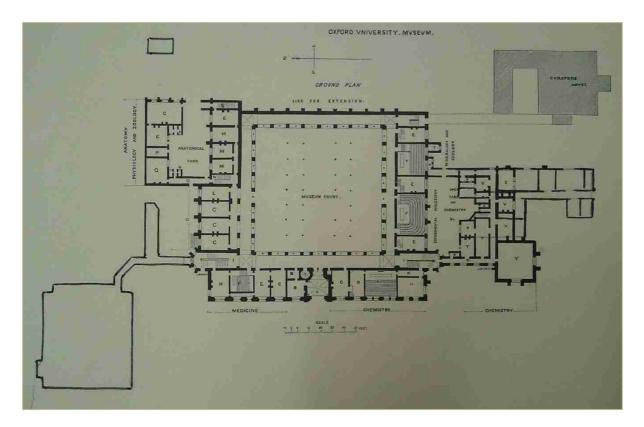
Plan of the University Museum c.1872 with additions inked on. Note the eastern elevation is labelled 'SIDE FOR EXTENSION.'
